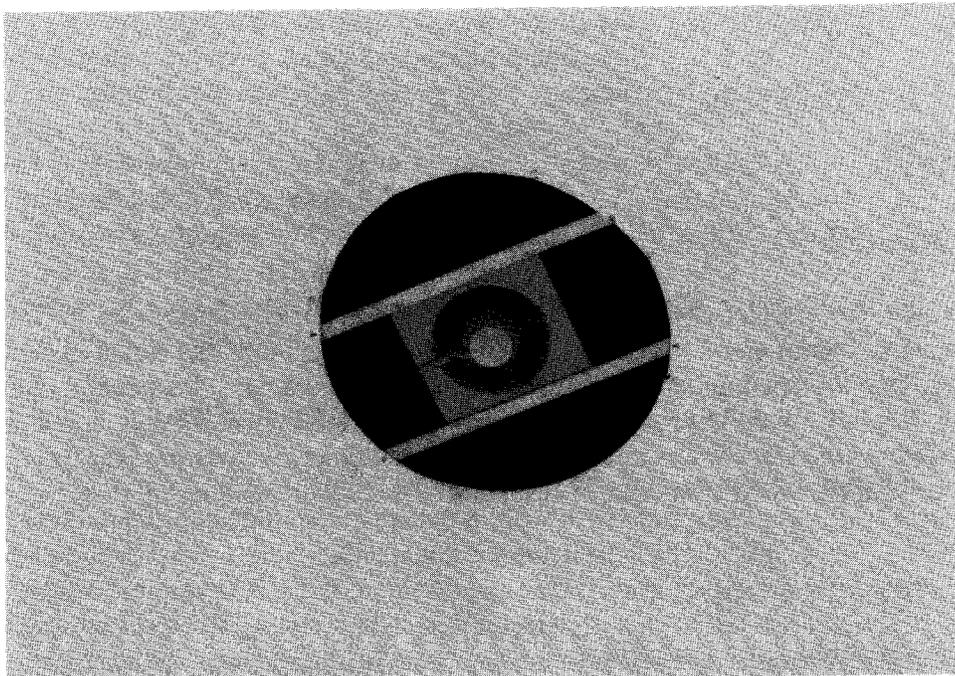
Room 112, ventilator at center of Lantern Deck ceiling.
